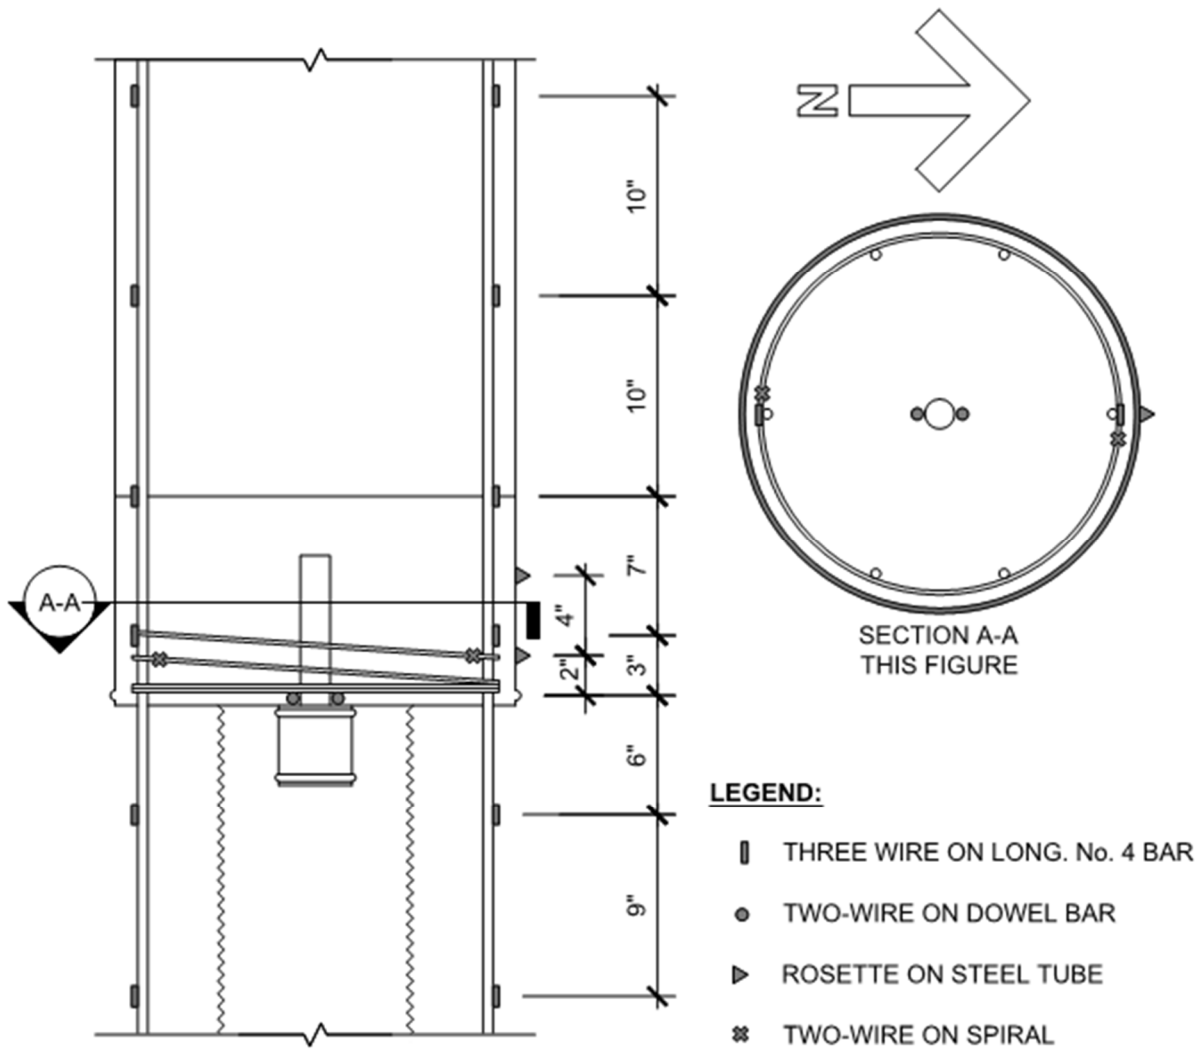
East elevation (left) and section (right) of strain gauge plan; strands and No. 6 bars are not shown.
